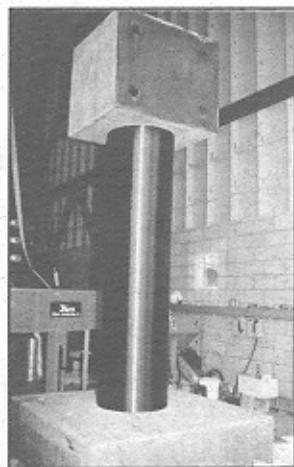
Strengthening of damaged and substandard concrete bridge columns
